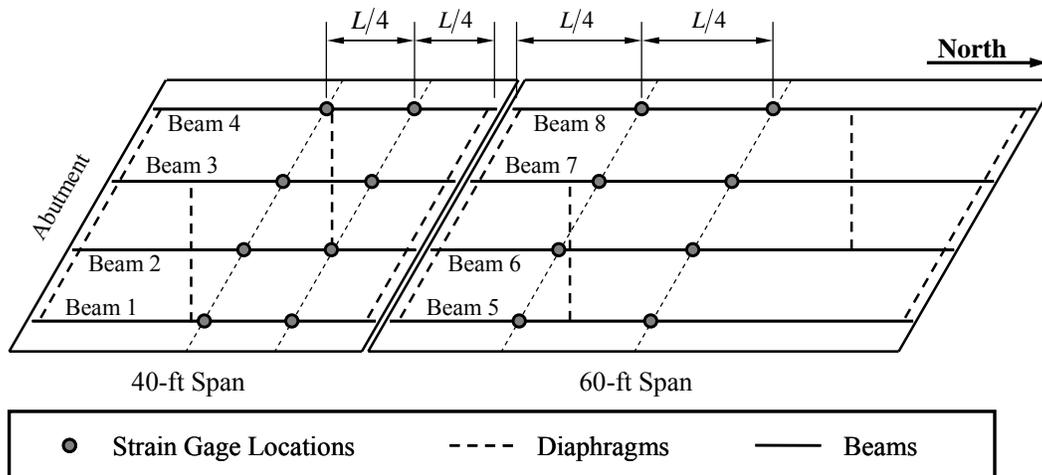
Instrumentation Plan for Chandler Creek Bridge
